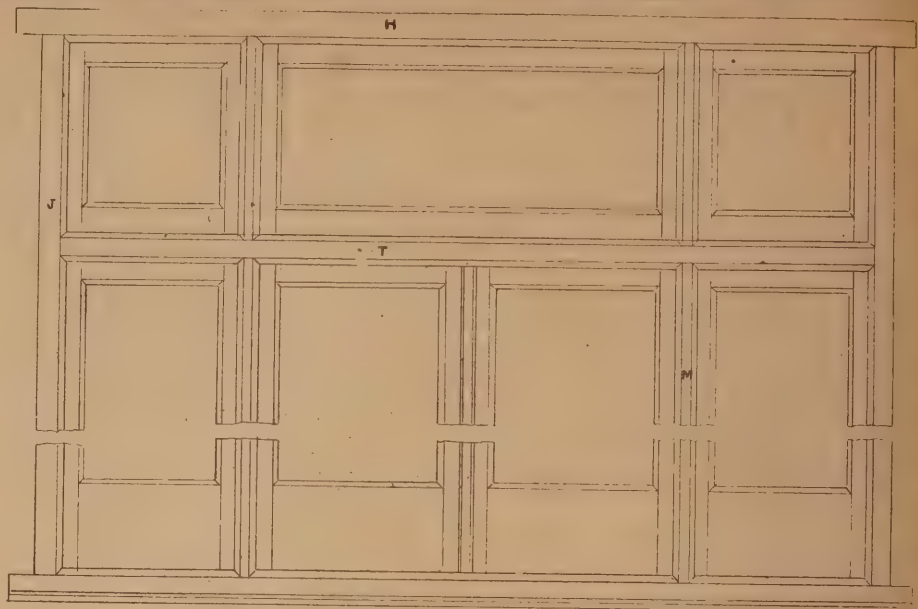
A FRENCH CASEMENT. INSIDE ELEVATION.
